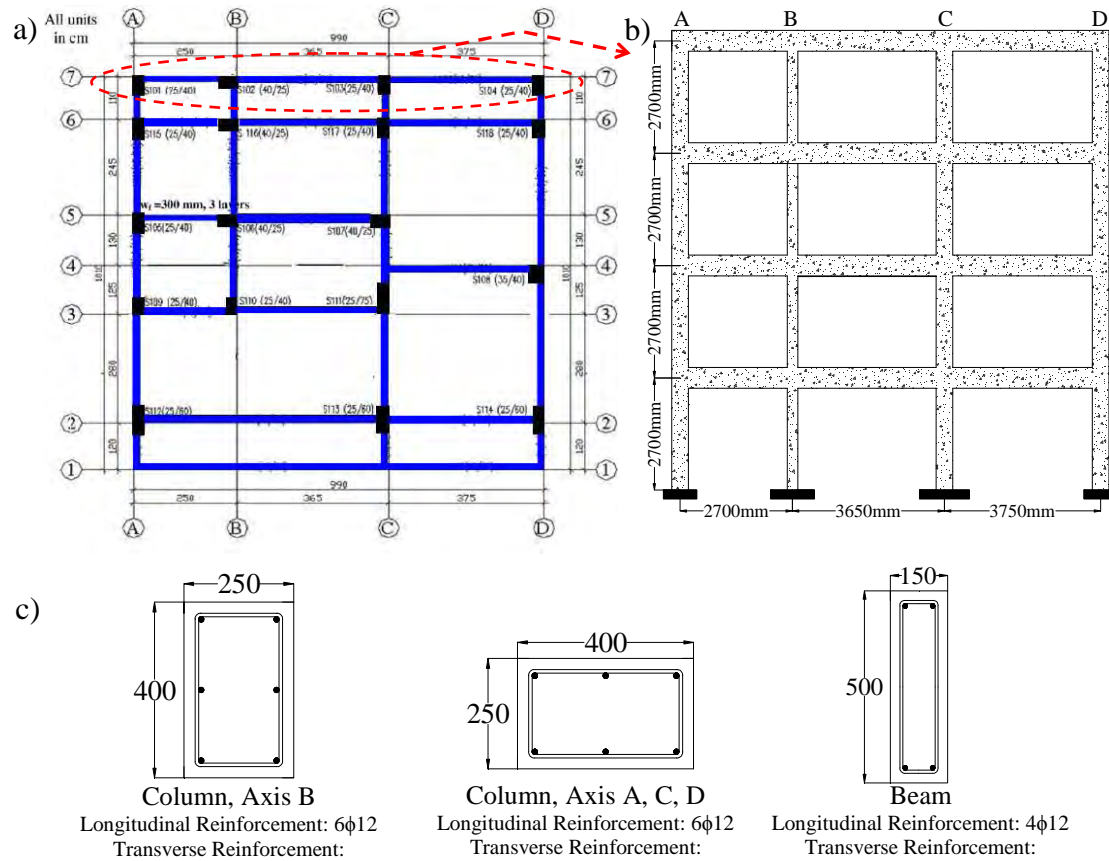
a) Analyzed building floor view, b) Analyzed 4-story frame, c) Beam and column section.
